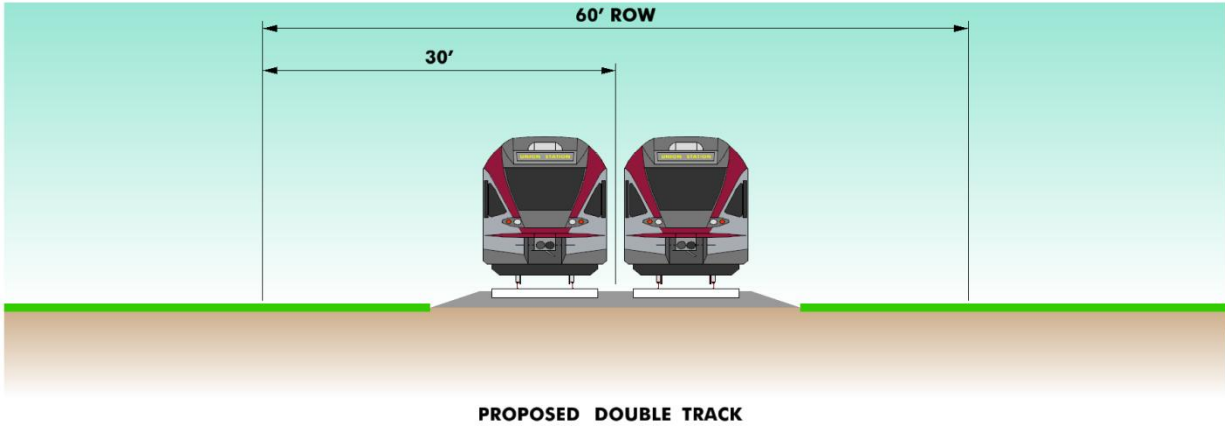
Regional Rail Typical Section on Common Segment – 2nd and Holmes Proposed Conditions
